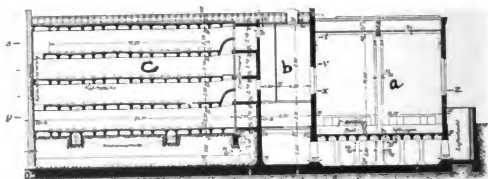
LONGITUDINAL SECTION OF AIR DRYING PLANT.
